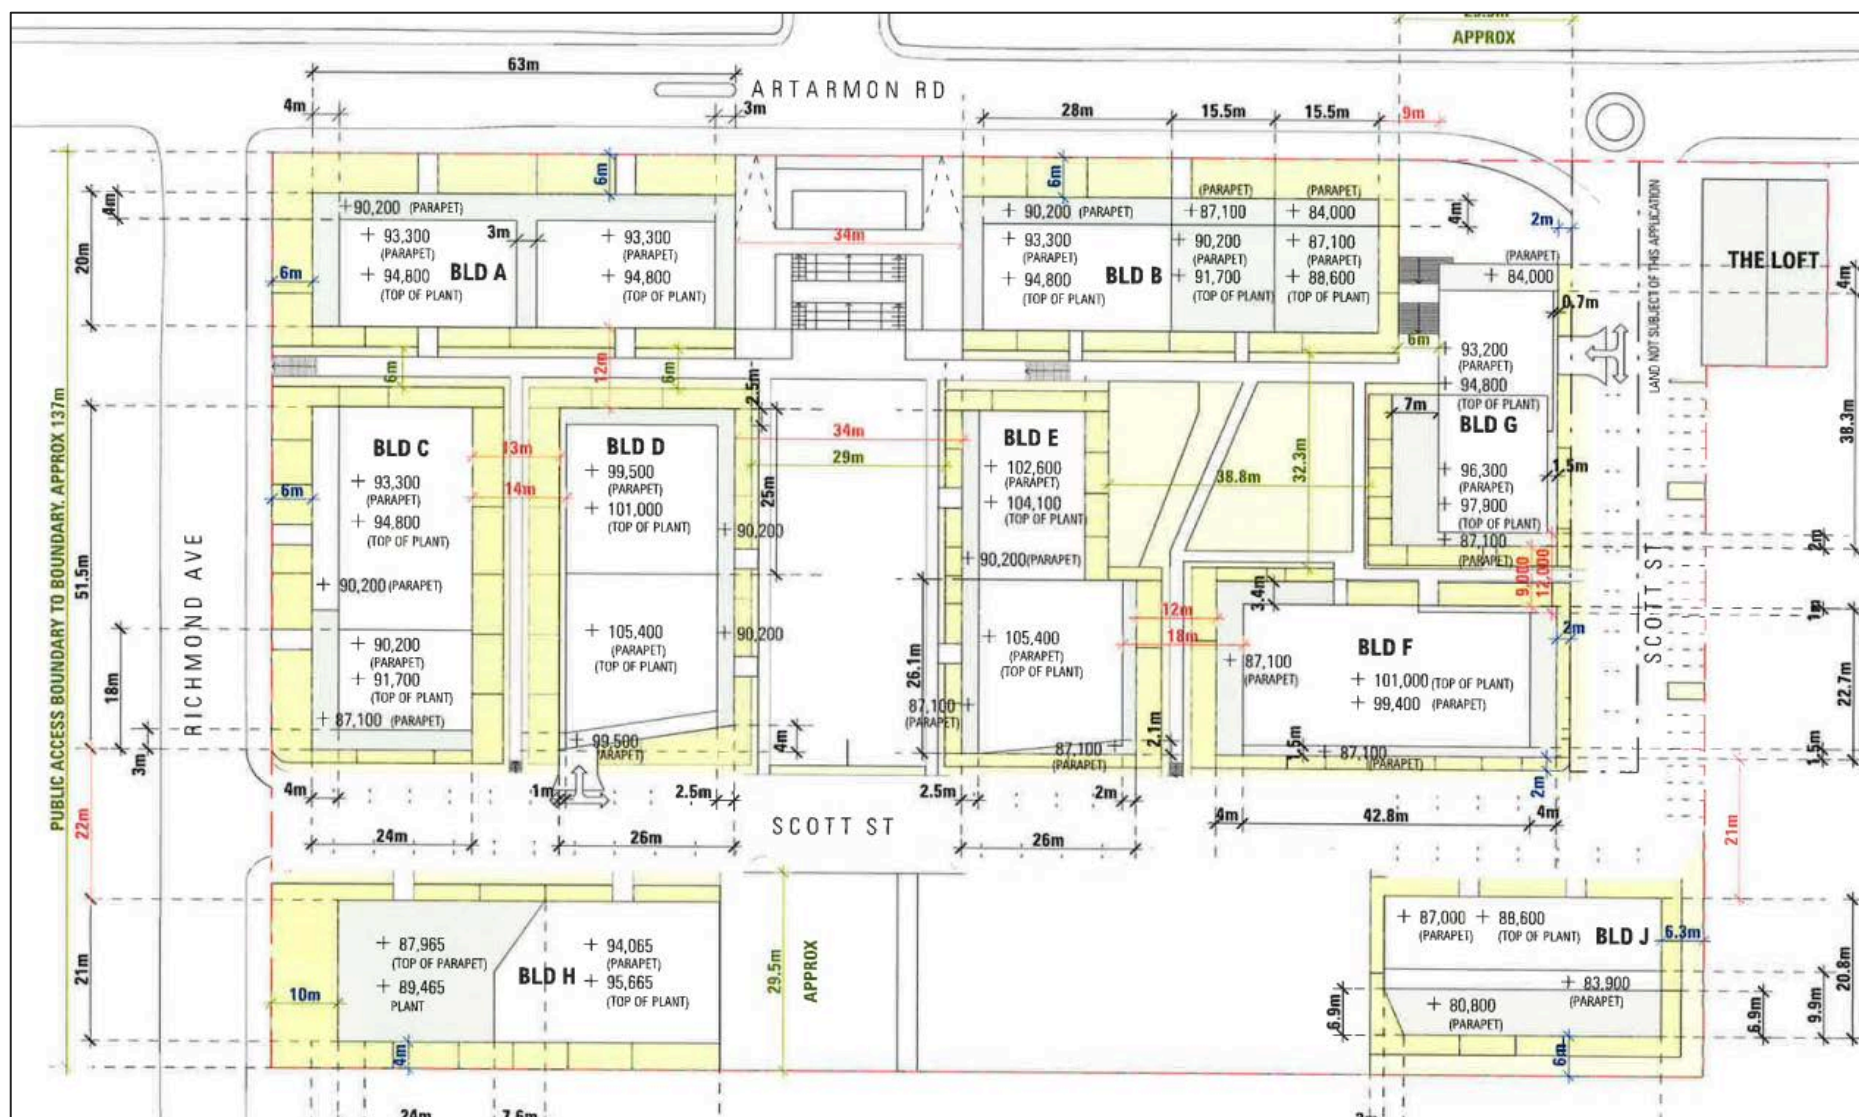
| Approved site layout (Source: MOD 2 Approved Plans)
